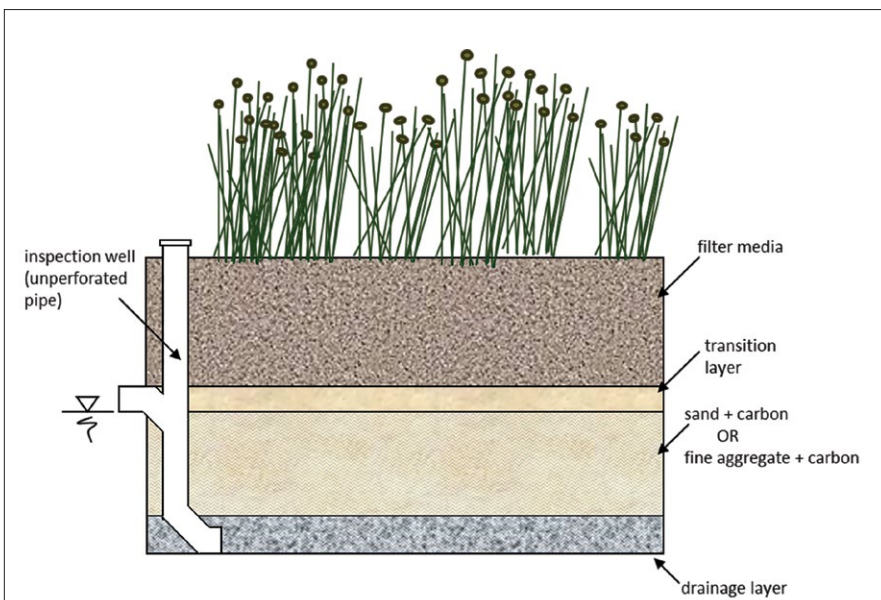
Long section of a biofilter with a submerged zone showing riser outlet (Note that, in this system, the transition layer is between the filter media and submerged zone). An appropriate screen should be placed over the outlet pipe entry in the drainage layer, to prevent ingress of the fine aggregate
